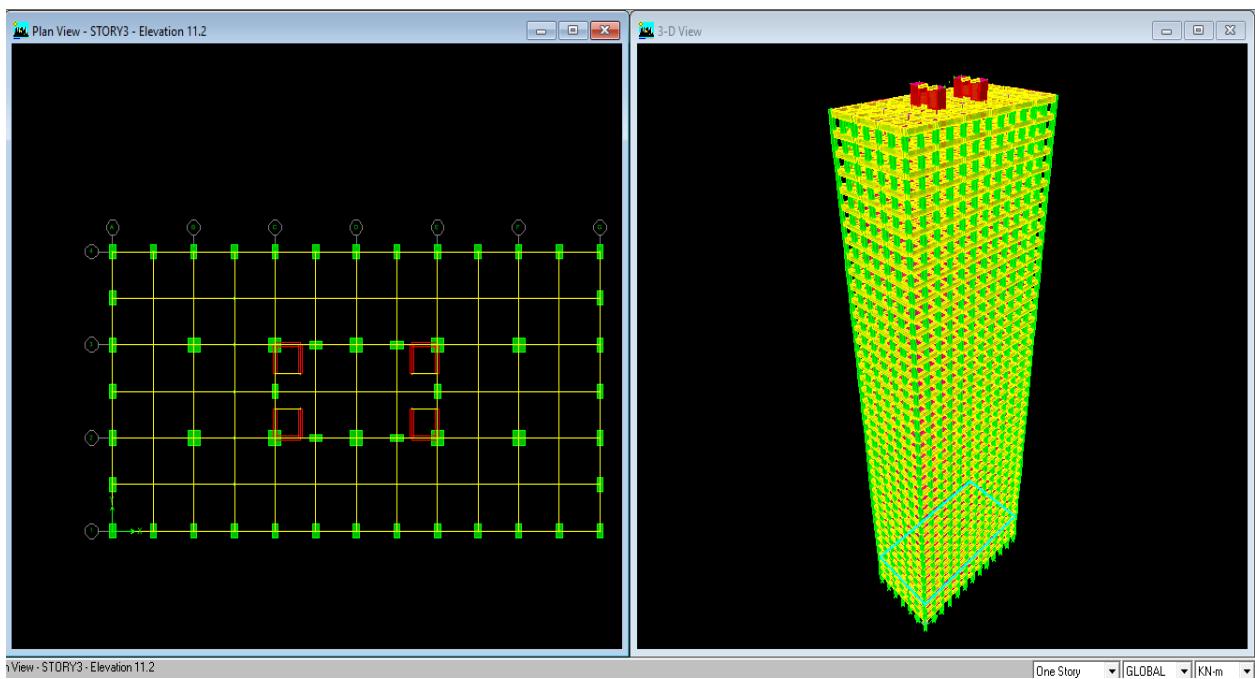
Plan view and 3-D view of 40 storied Tube-in-Tube structure building
